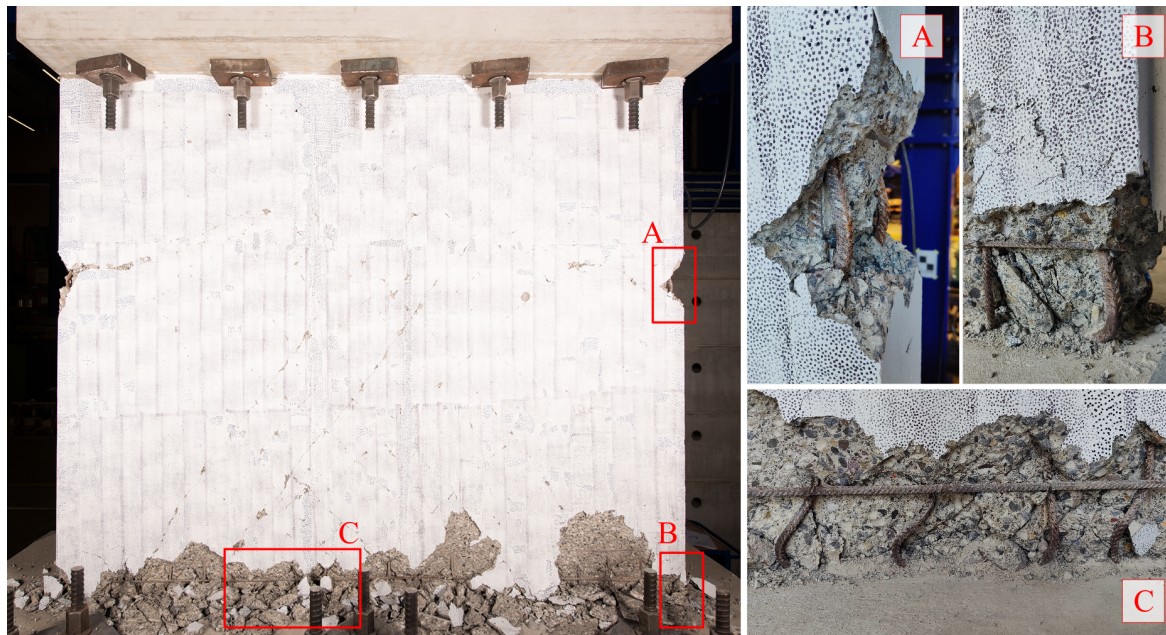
Final state of Specimen HSW01: (a) DIC side of the specimen; (b) Detailed view of areas A (end of vertical reinforcement bars originating in the top beam), B (bottom corner), and C (sliding zone at the wall-foundation cold joint).
